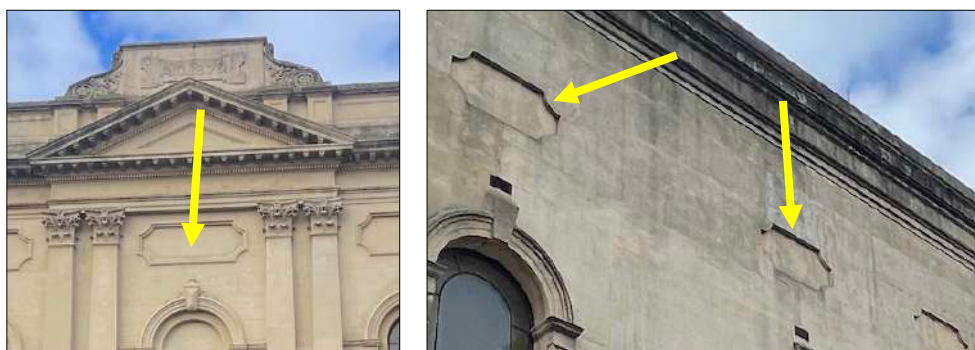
Detail of the south and west elevations of the main hall showing the decorative motif that is to be used as a key design feature of the proposed additions.
